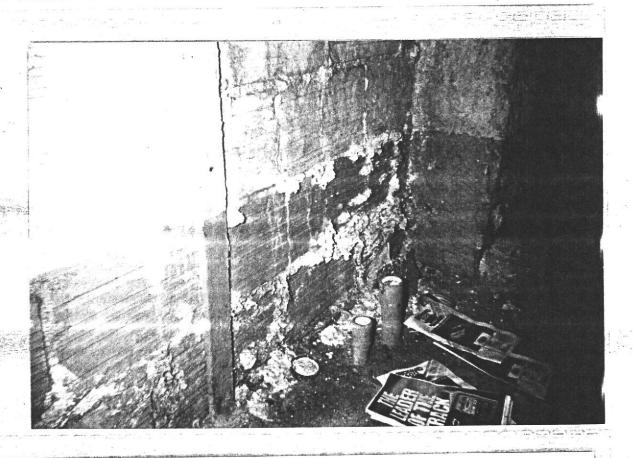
View of South Wall, Foreground Area of Photo 1 4525 Horton Street, Emeryville, California 14 October 1996
